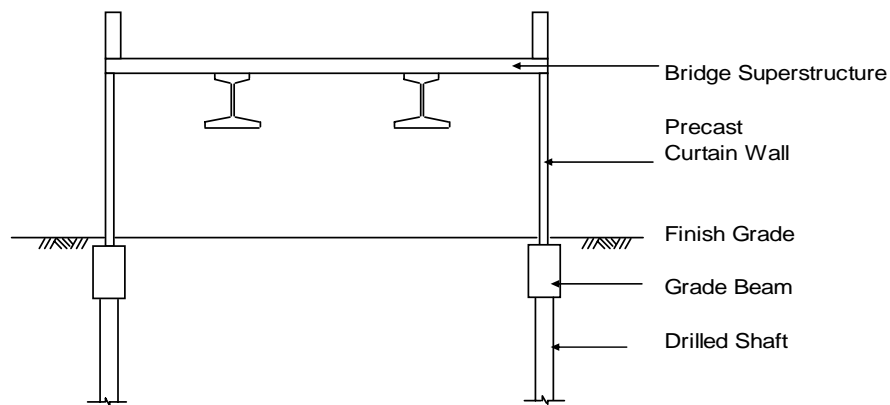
Precast Concrete Bridge (PCB) Design Concept
